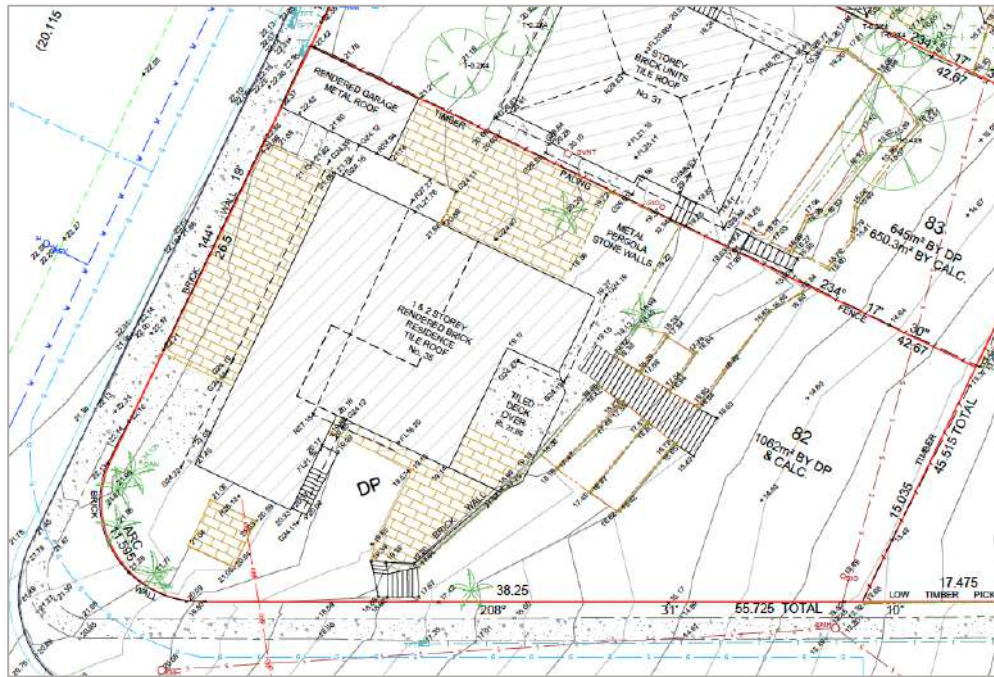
Site survey. No. 35 Reddall Street, Manly.
